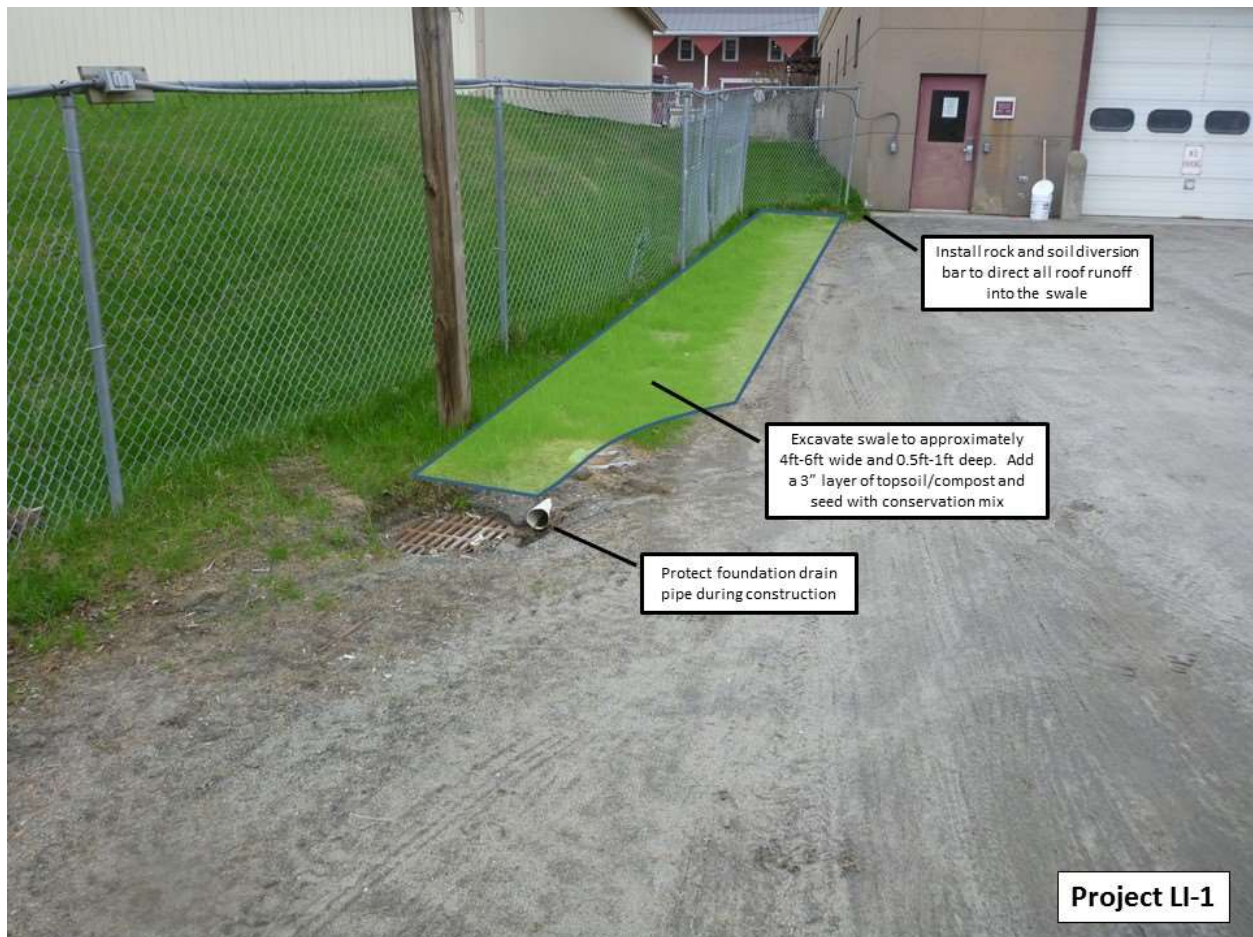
Design-build plan produced by FEA for the LI-1 project site.
